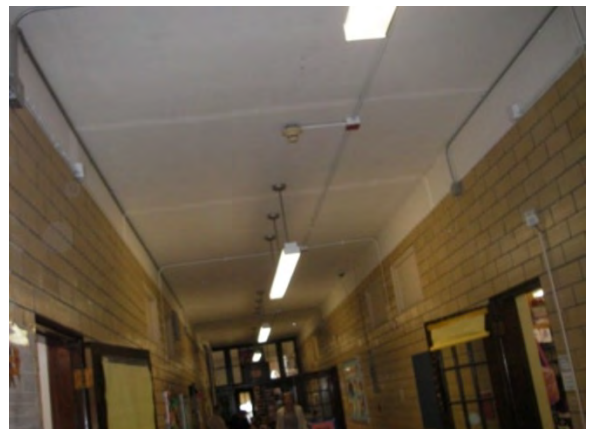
HALL CEILING, LIGHTING, AND SMOKE DETECTORS
